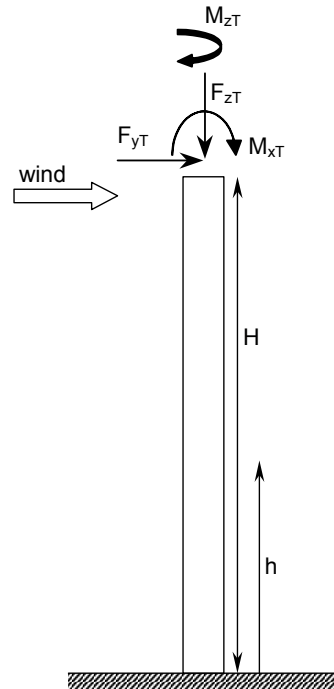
Cantilever beam model of a tubular tower subject to loading at the level of the hub.
